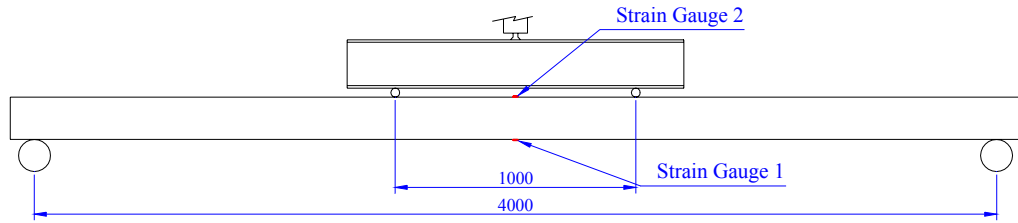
Basic Layout of Fatigue Test on Steel Beam
